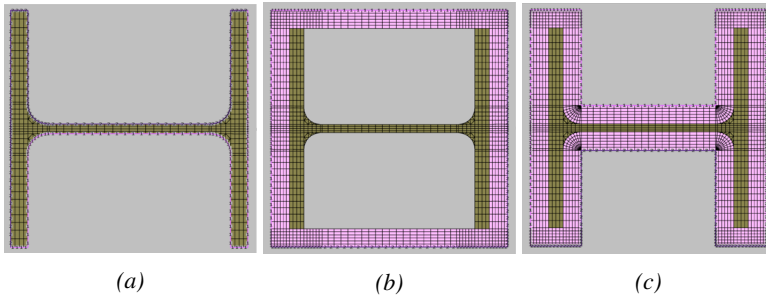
Sections: a) Columns #A and #E; b) Columns #B and #C; c) Column #D.
